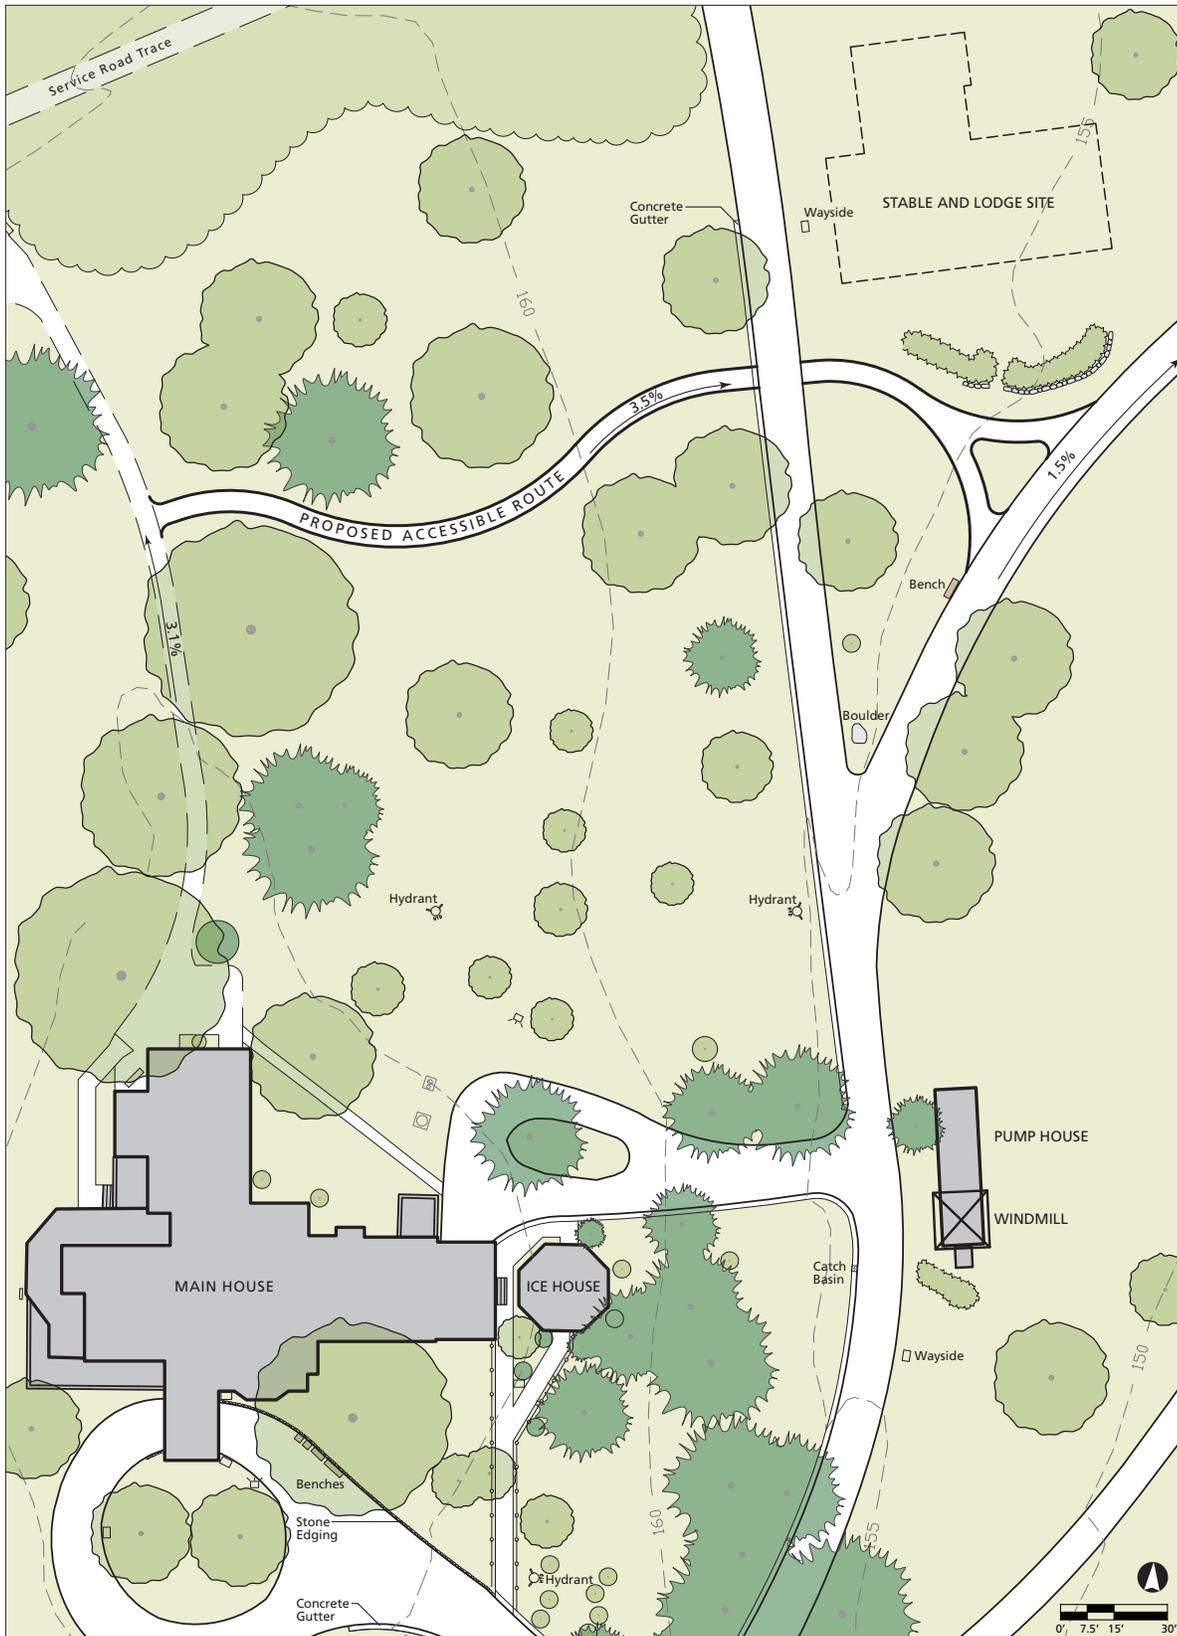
Diagrammatic plan of the proposed accessible route to the Theodore Roosevelt Home. The accessible route should use the existing walk north of the Farm Shed and then branch to the northwest on a new walk near the Stable and Lodge site. After crossing the drive, the route should continue west avoiding trees that date to the Roosevelt tenure. The route then proceeds south on the Pet Cemetery path toward an accessible entrance at the northwest corner of the veranda (Olmsted Center, 2009).
